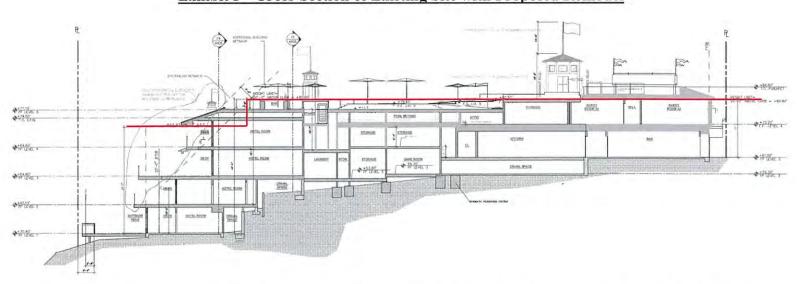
Exhibit I - Cross-Section of Existing Site with Proposed Remodel
